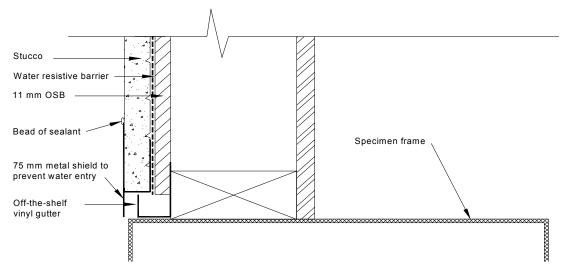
Control joint detail for specimens No. 1 to No. 4 - Horizontal section
